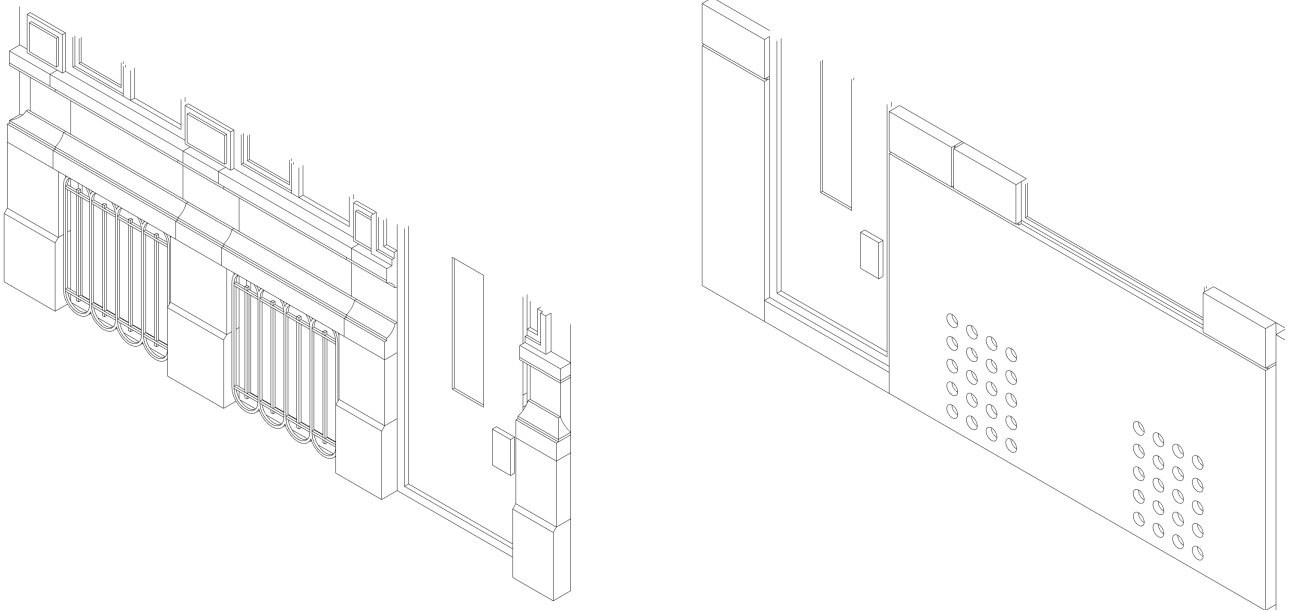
, drawings of the plinths of the existing mansions (left) and new building (right) of Pension van Schoonhoven (own work)
